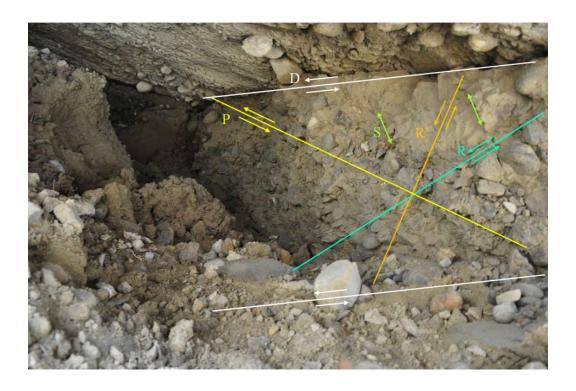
Shear textures existing in the soil beneath sidewall foundations
